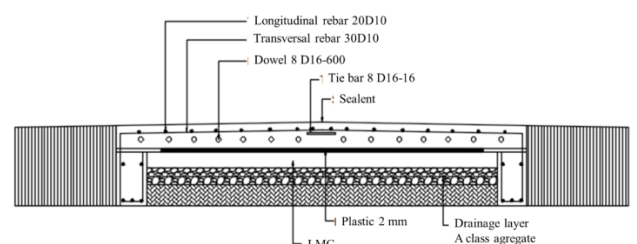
Cross section design of Rigid Pavement for Rancacili Road in Rancasari District
